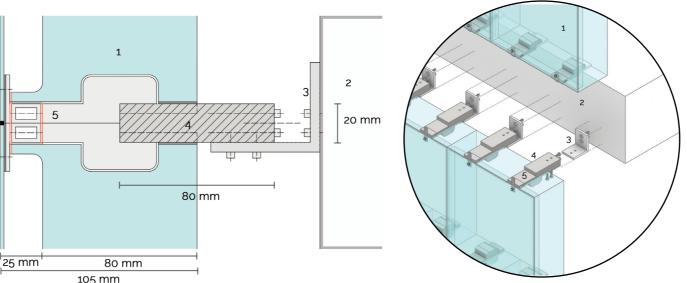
Figure showing (a) section detail and (b) exploded view of bottom connection
